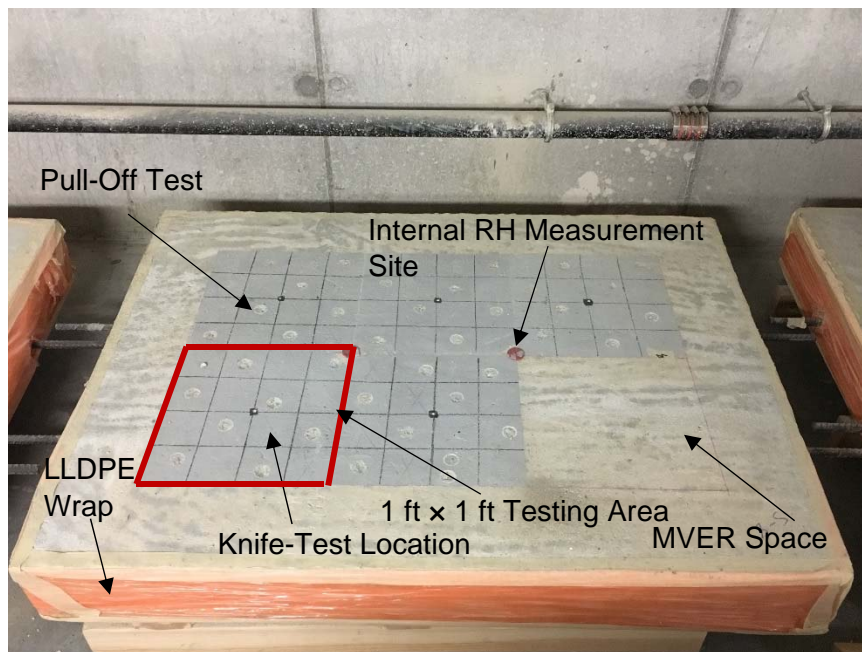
Slab specimen showing testing subdivisions and test locations
